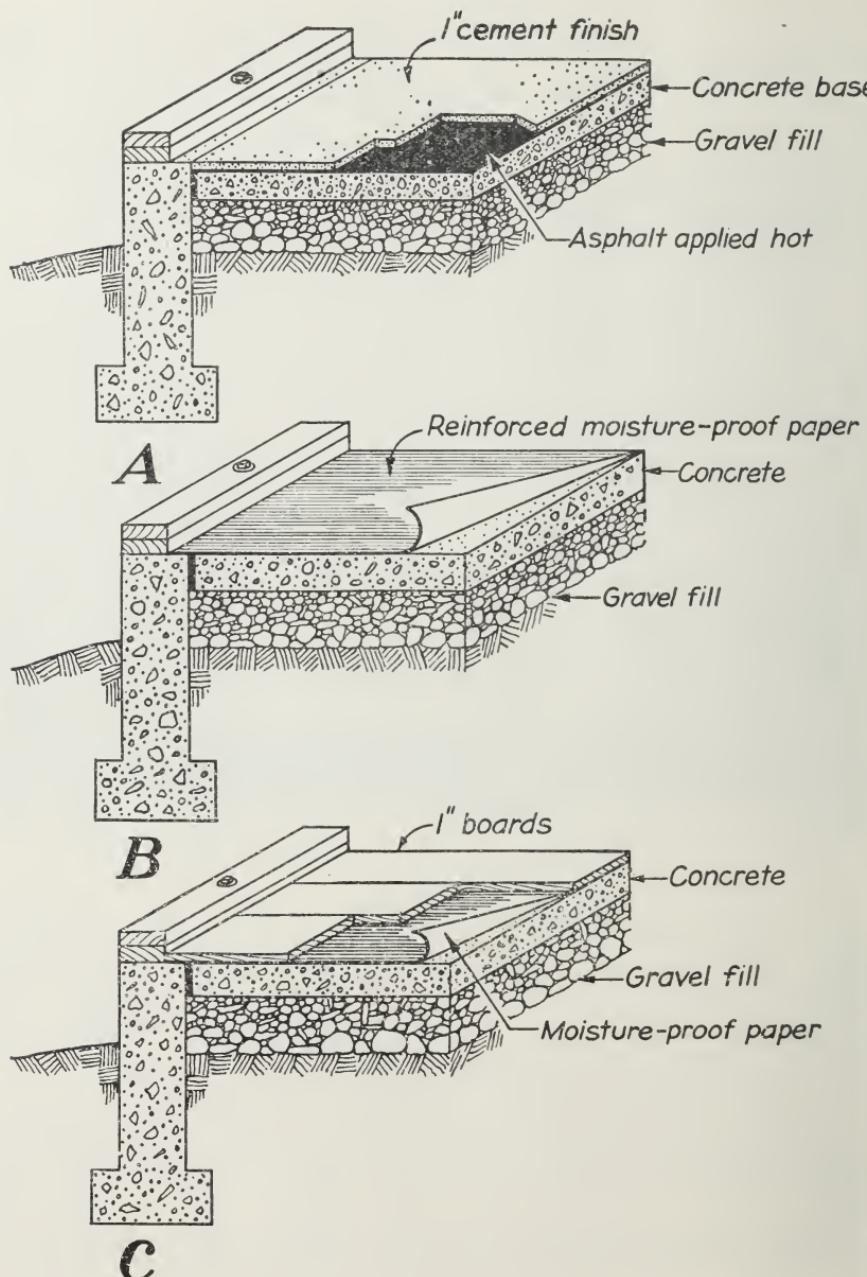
Methods of constructing and treating concrete floors to reduce spoilage of wheat: *A*, Two-course concrete floor, with layer of asphalt between courses; *B*, moisture-proof kraft paper over concrete; *C*, loose boards over concrete.
